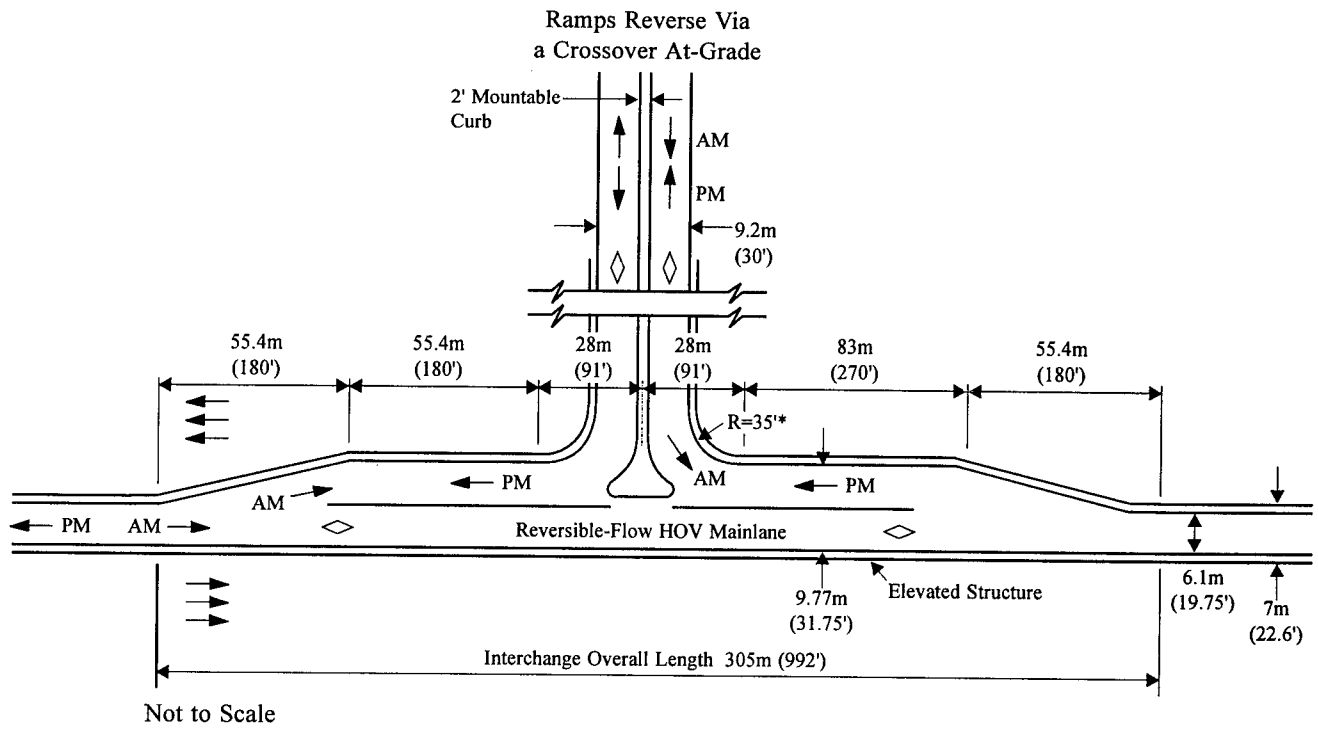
Example of Layout for Reversible Flow T-Ramp
